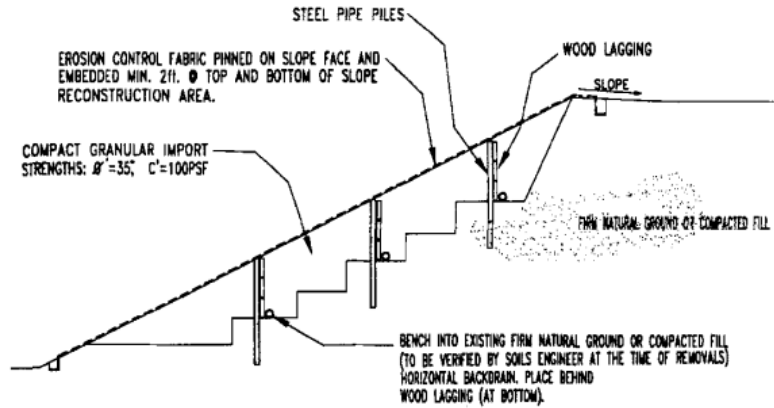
Pipe Pile and Wood Lagging (Day, 1996).
